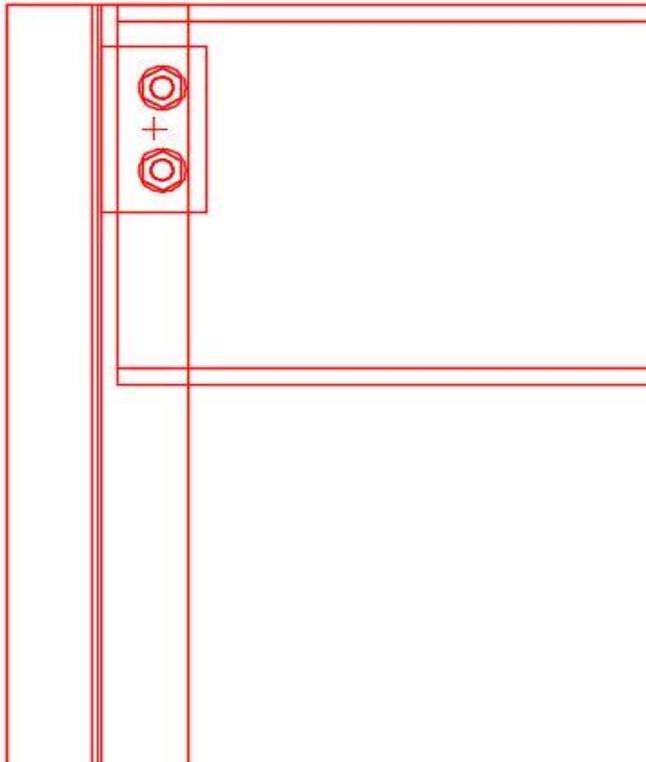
Analysis of shear plate connection in 2D wireframe(Elevation) when connection is failed.
